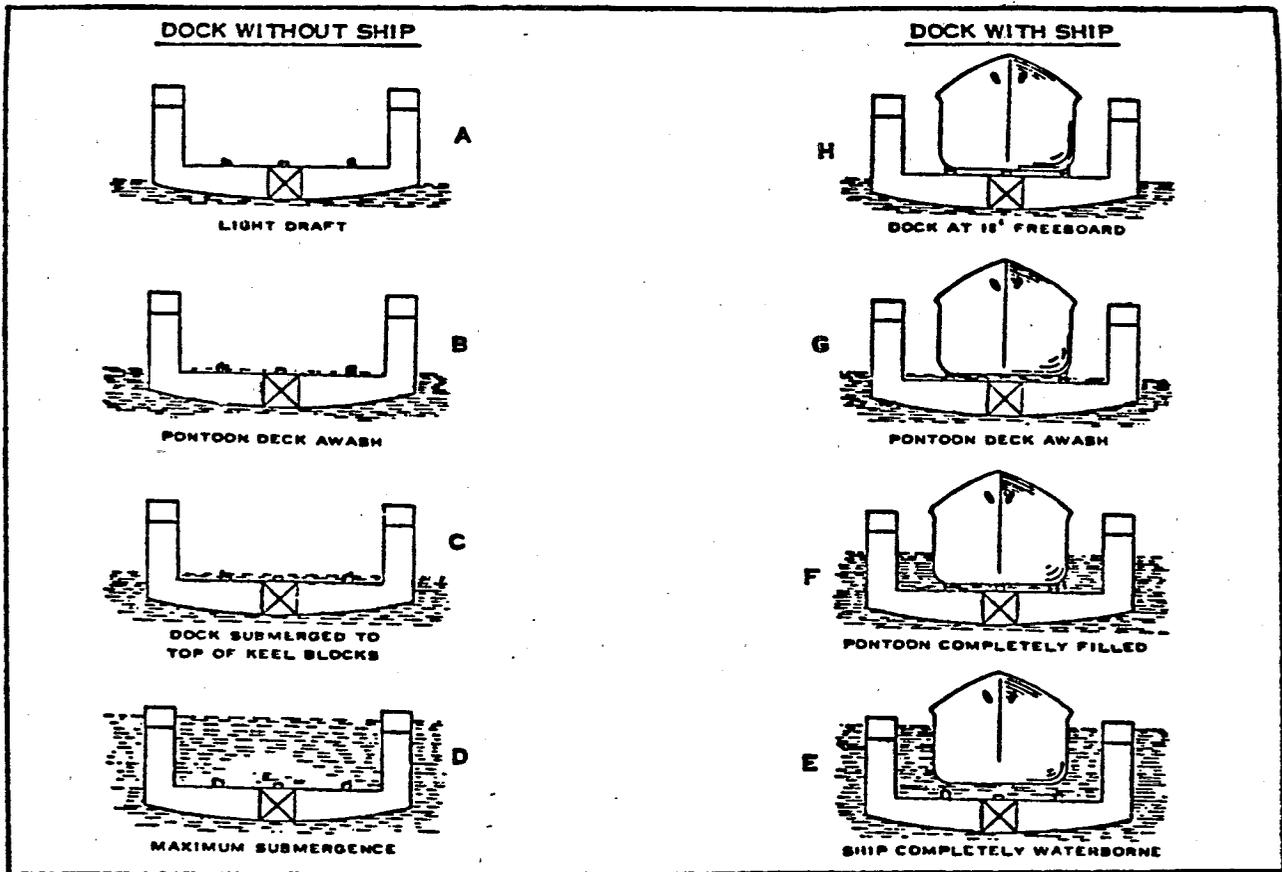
Typical Inside and Outside Water Levels For Complete Docking Cycle of Floating Drydock
